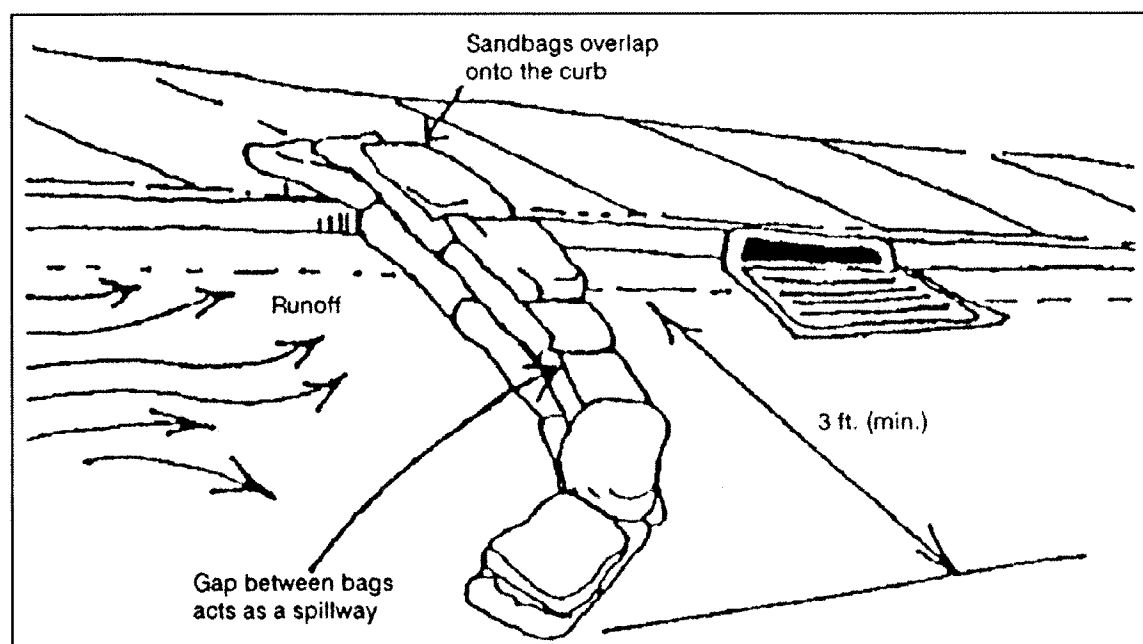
B. Detail of sandbag curb sediment barrier.
